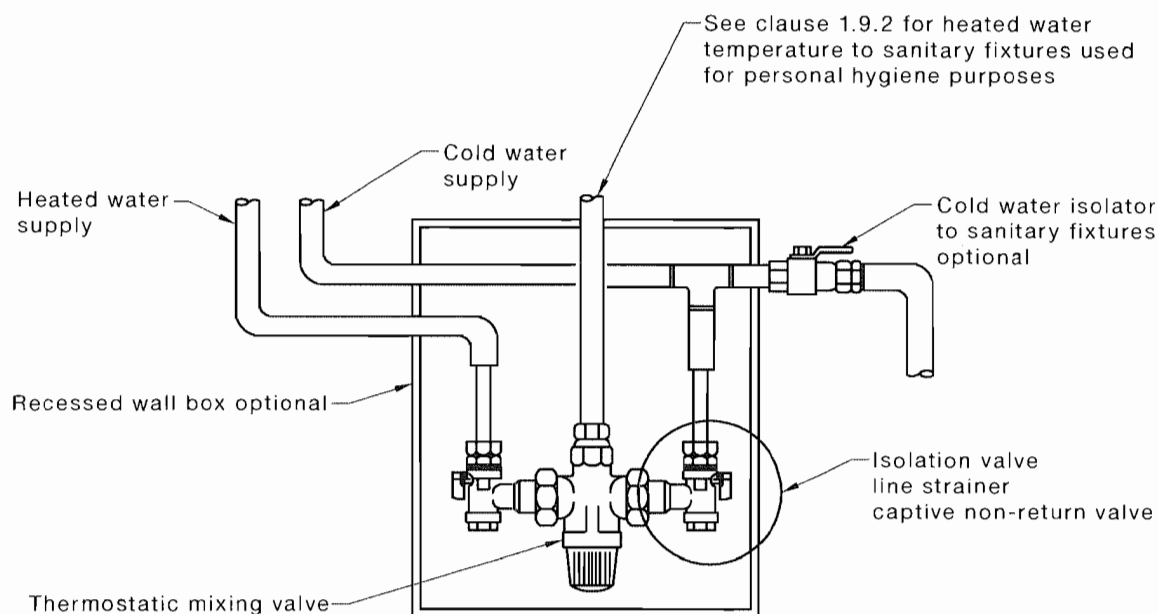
TYPICAL ISOLATING ASSEMBLY FOR WATER SUPPLIES TO THERMOSTATIC MIXING VALVE
